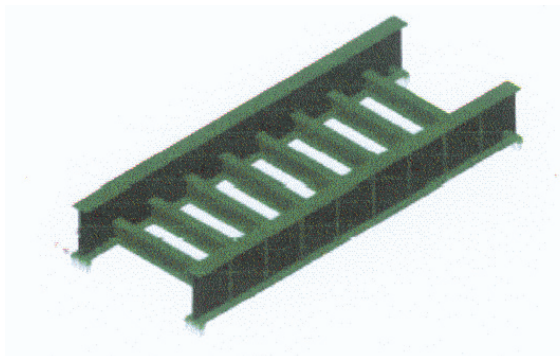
Girders and floor beams constitute the U-frames of the bridge (Figure courtesy of Professor Kuldeep Virdi).
